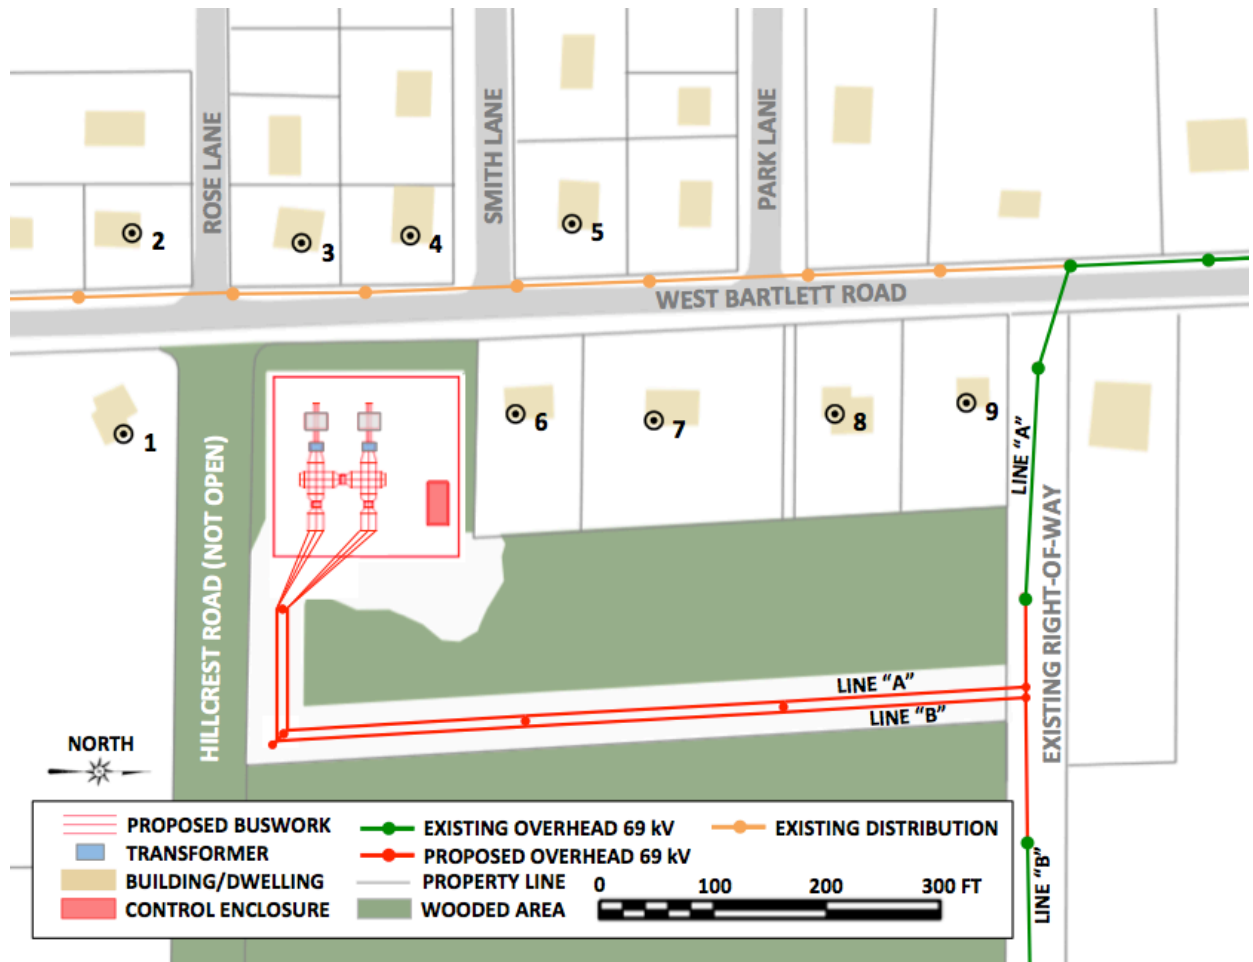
Proposed layout of the West Bartlett Substation and proposed overhead circuits in relation to the existing ROW and buildings in the vicinity of the Project
